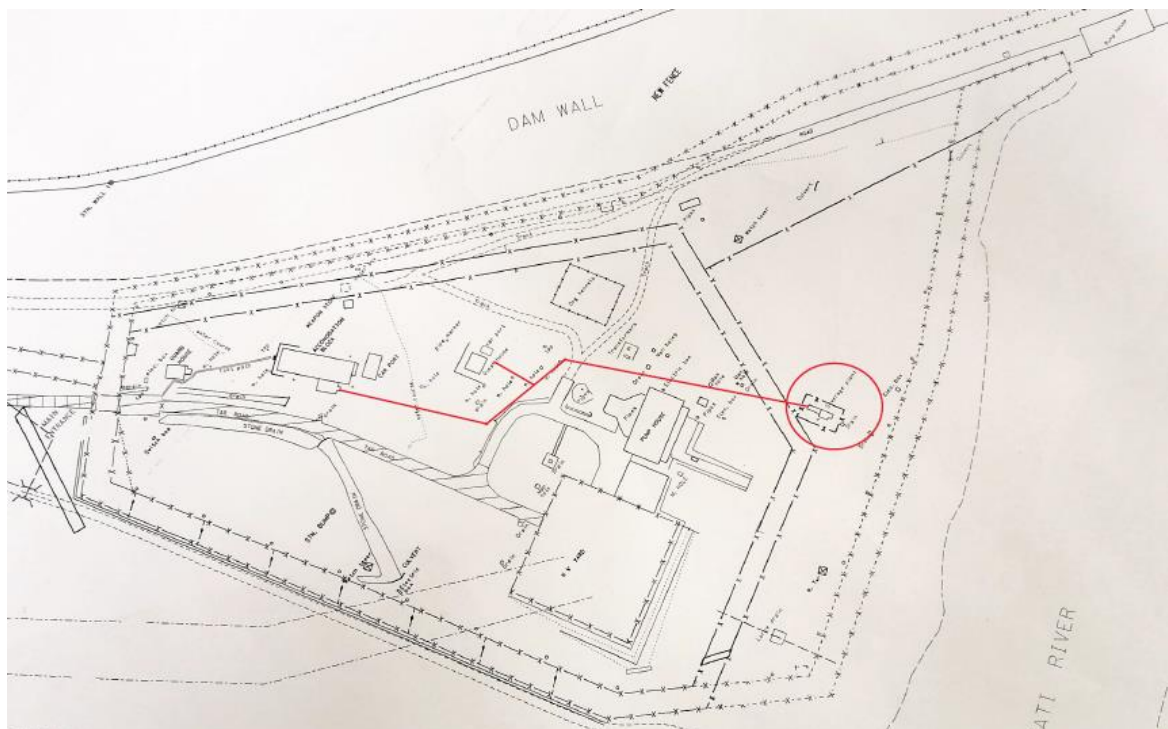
Vygeboom plant layout showing the flow of sewage from the ablution facilities to the sewage plant.
